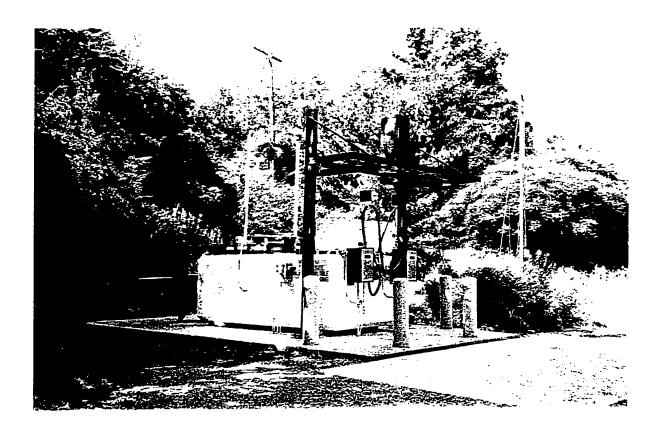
Fuel station, southeast and northeast elevations, 1997. (Photograph by the author).
